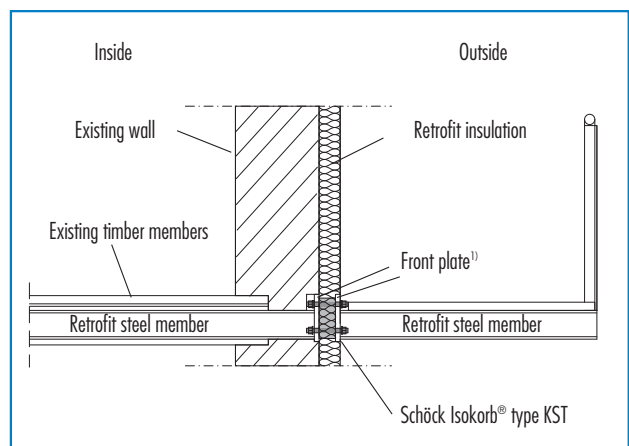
Schöck Isokorb® type KST for a renovation/retrofit balcony installation
